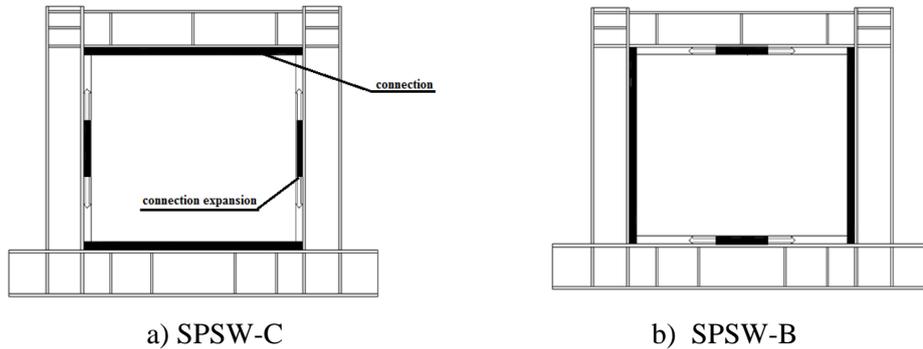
The schematic representation of the infill wall connection conditions for use in steel plate shear wall applications
